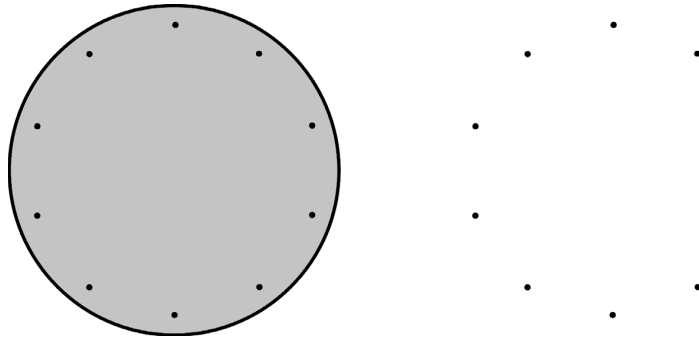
Transition from a composite reinforced concrete cross-section to a section in which only the longitudinal reinforcement contributes to the resistance.
